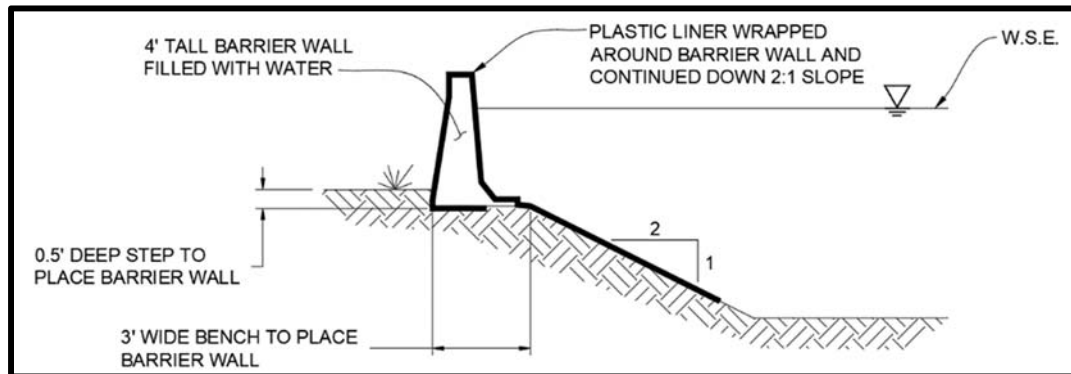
Detail of combined barrier wall and excavated sediment basin.
